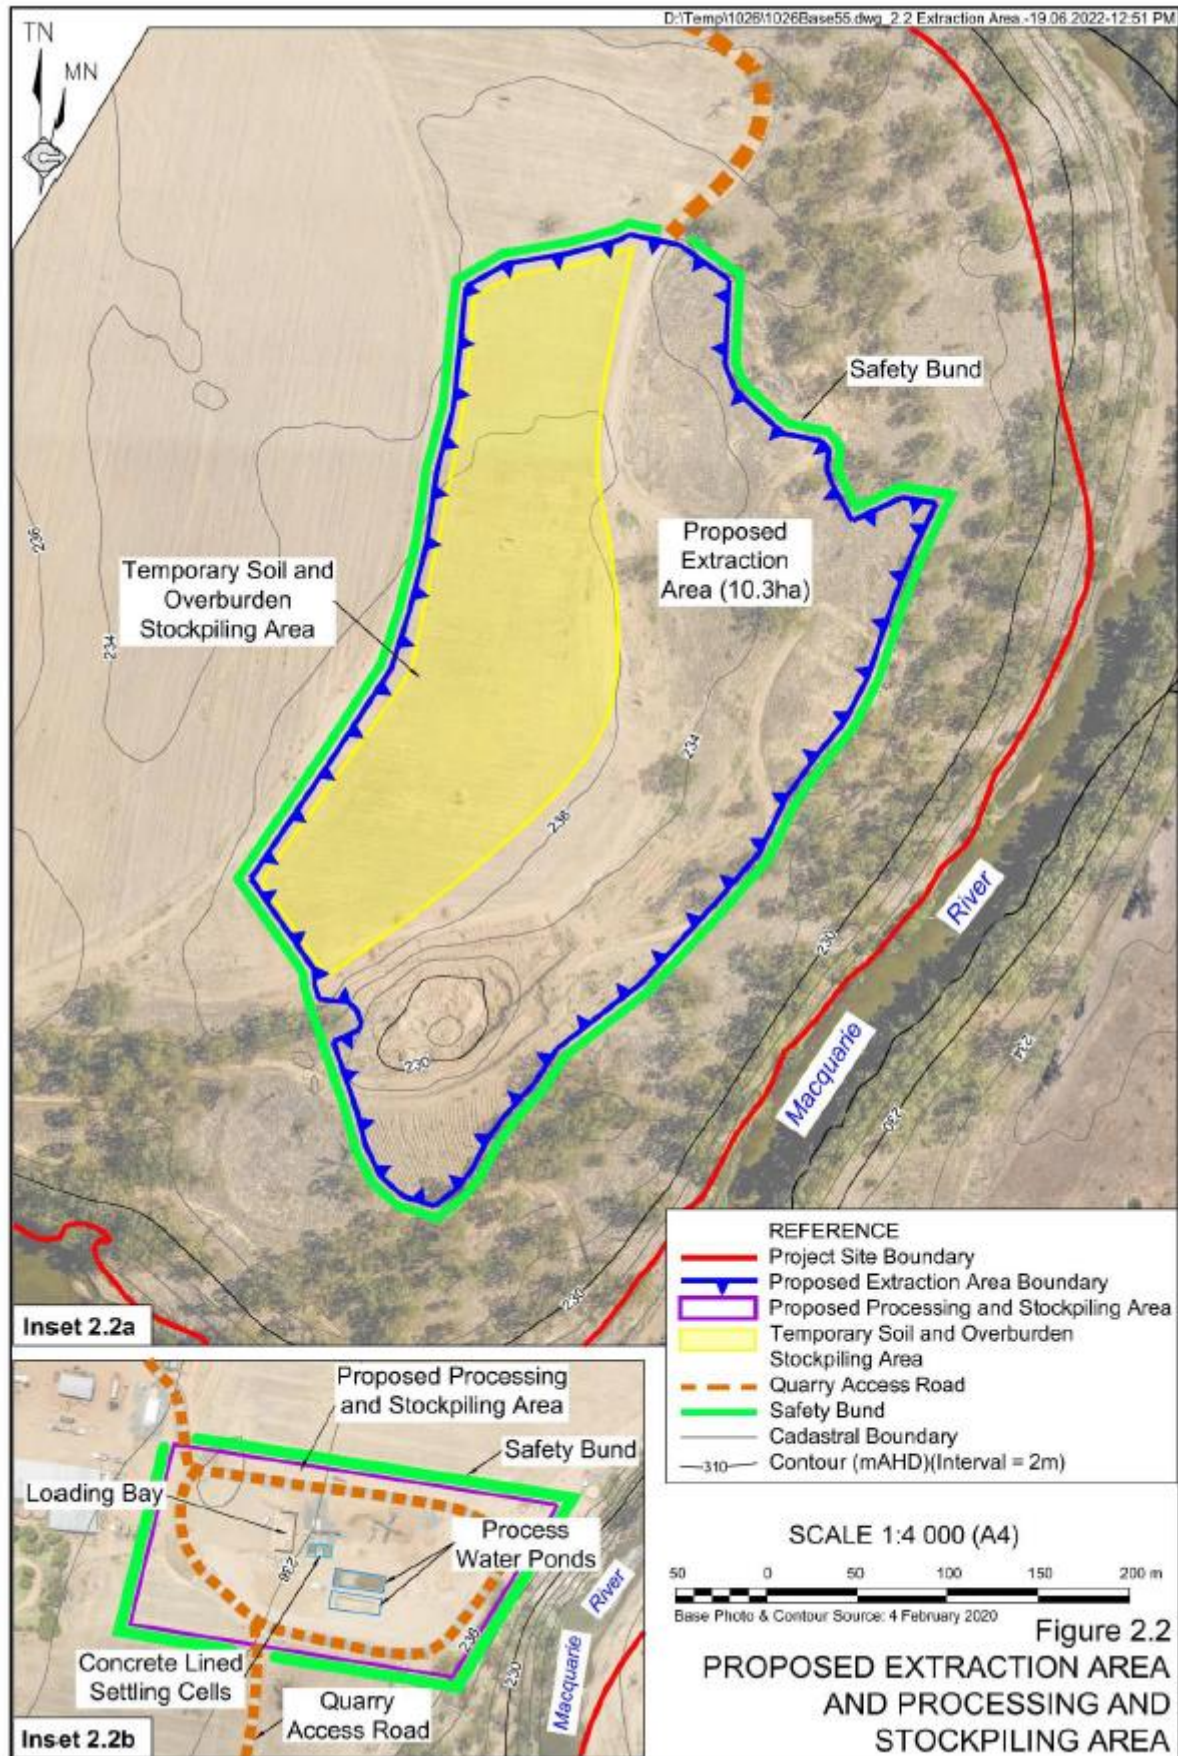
Proposed site layout detail (R W Corkery & Co 2022)
